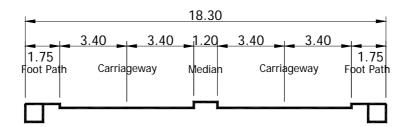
Proposed Typical Cross Section for Marine Drive
